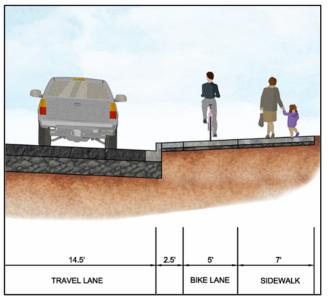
Elevated Bike Lane and Sidewalk Alternative (MM3).
